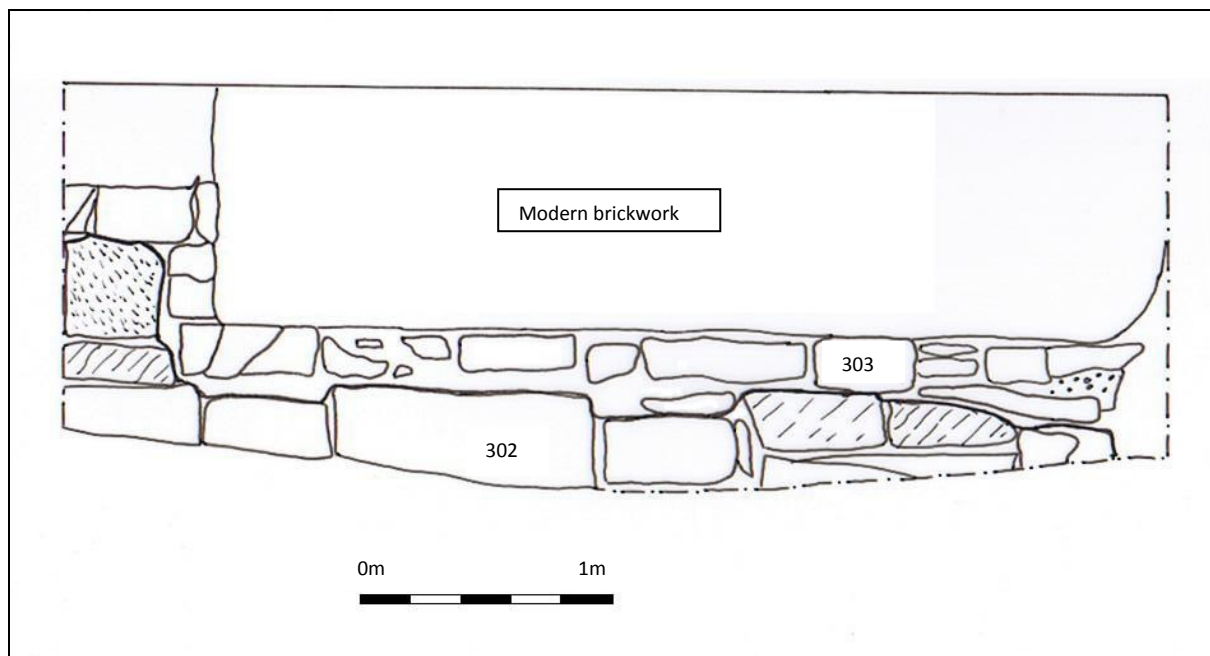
South facing section showing possible original stonework 302 and rebuild 303
